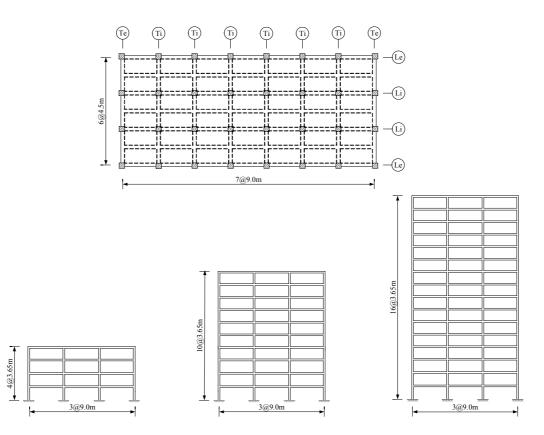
Plan of floors and elevations of transverse frames of the buildings.
